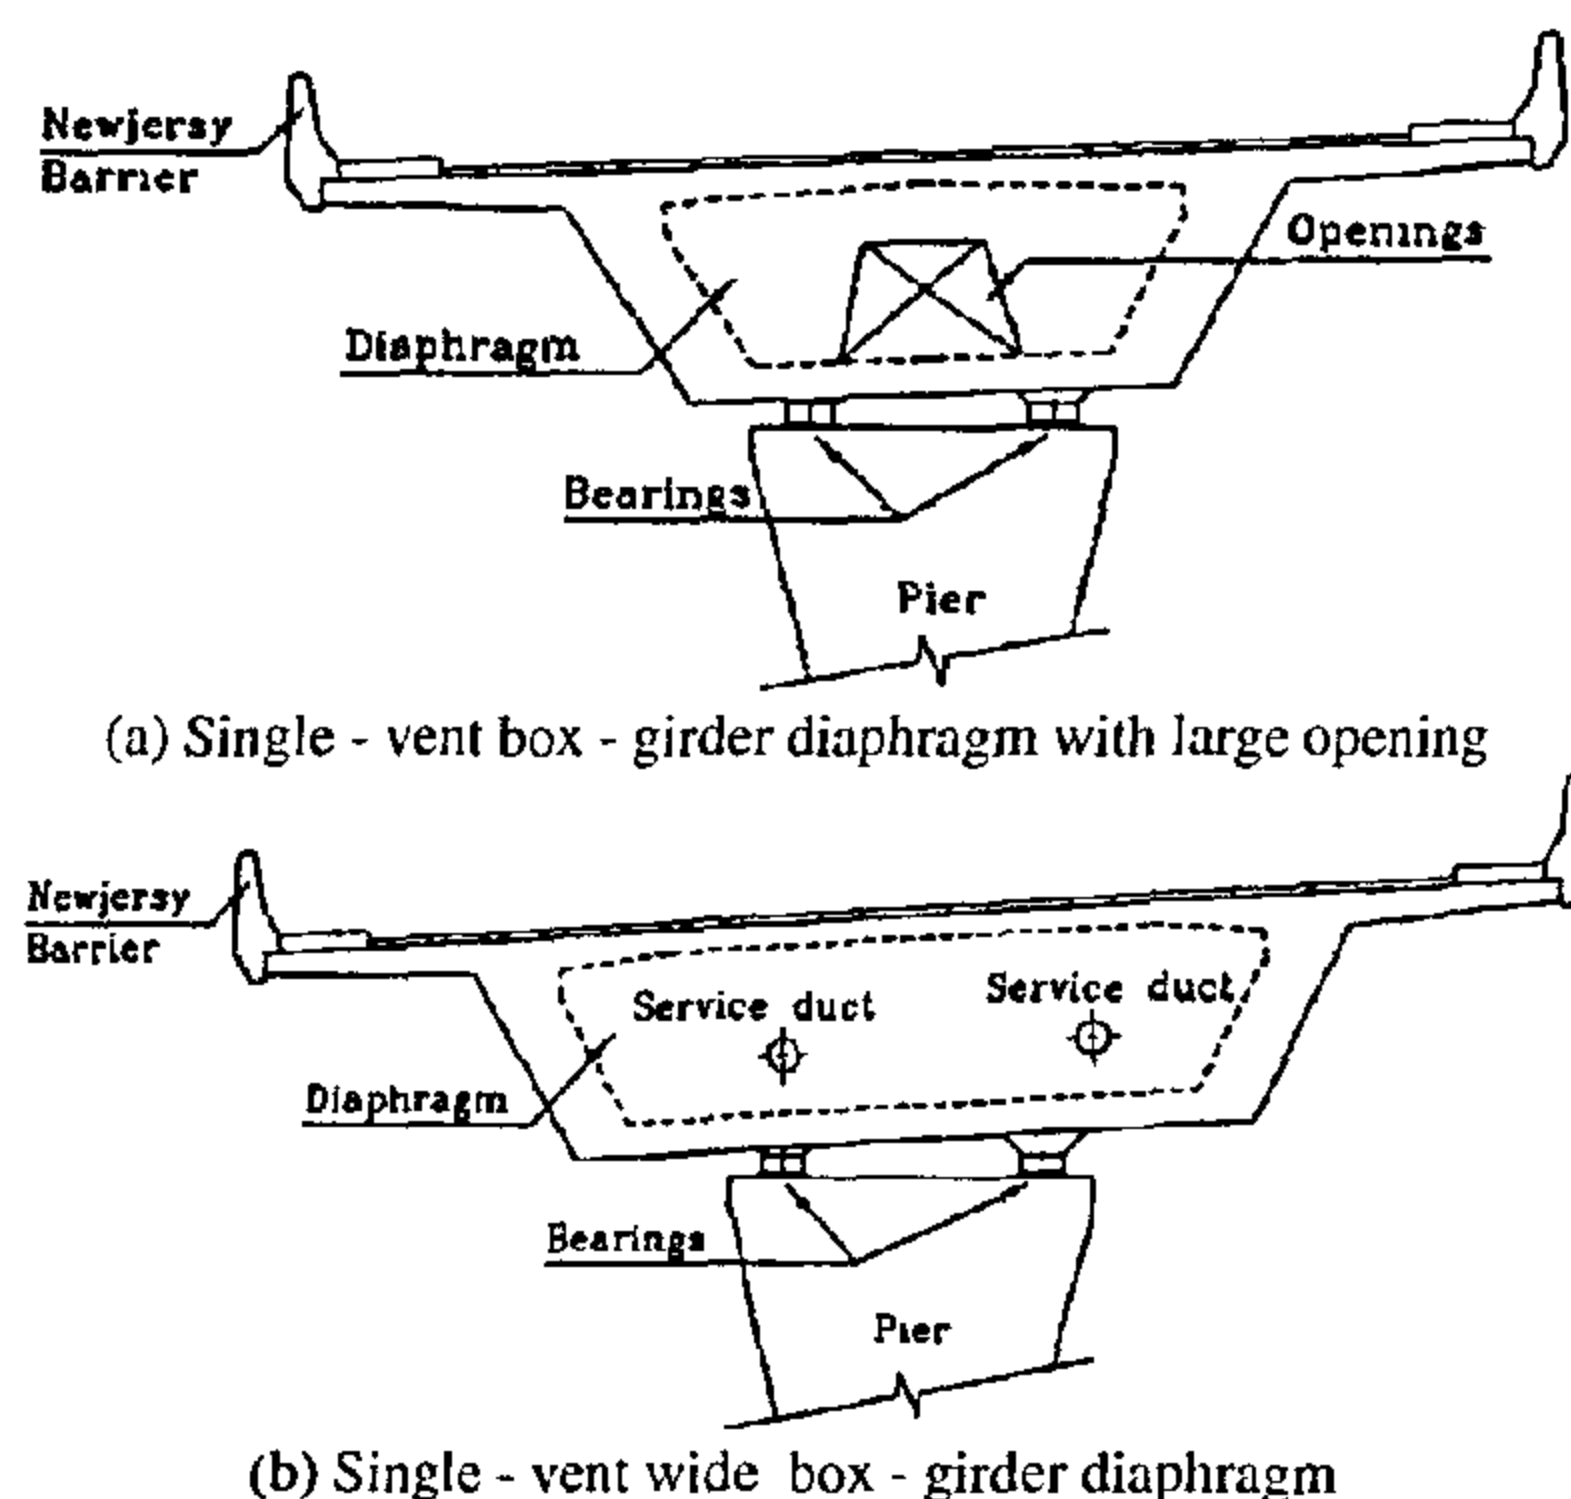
Typical forms of single - vent box - girder bridge diaphragms
